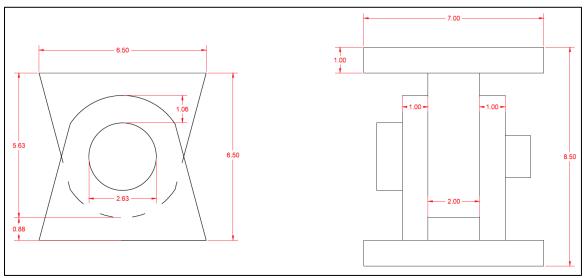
Frame Connection of Pedestrian Bridge with Column (2 of 2)
